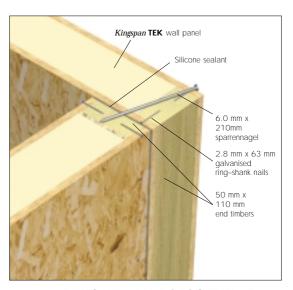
FIXING WALL PANELS TOGETHER AT CORNERS
